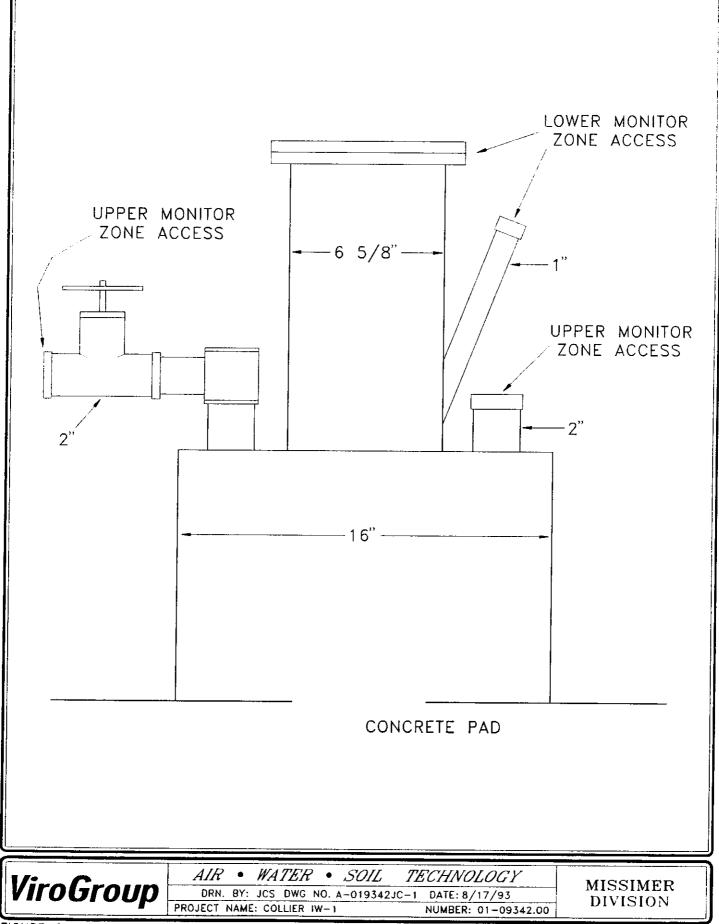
DUAL ZONE MONITOR WELL - WELLHEAD CONSTRUCTION DETAILS.
